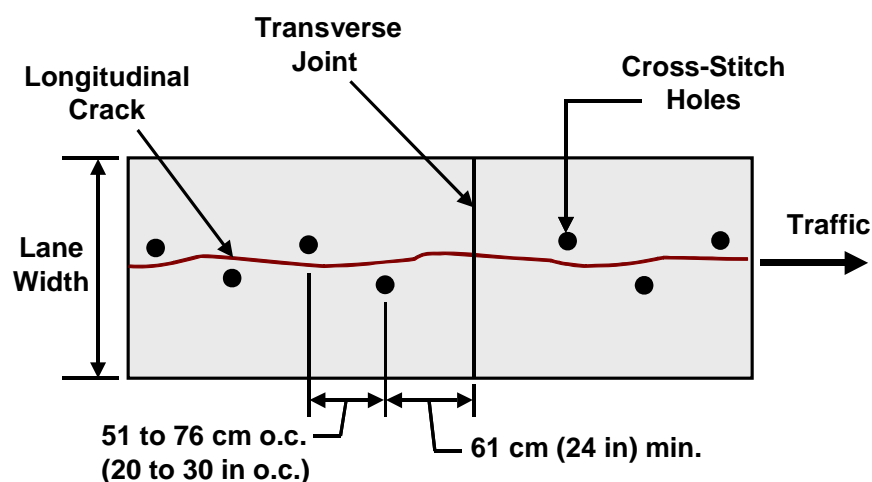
Schematic of cross-stitch tiebar installation (ACPA 2001a).
